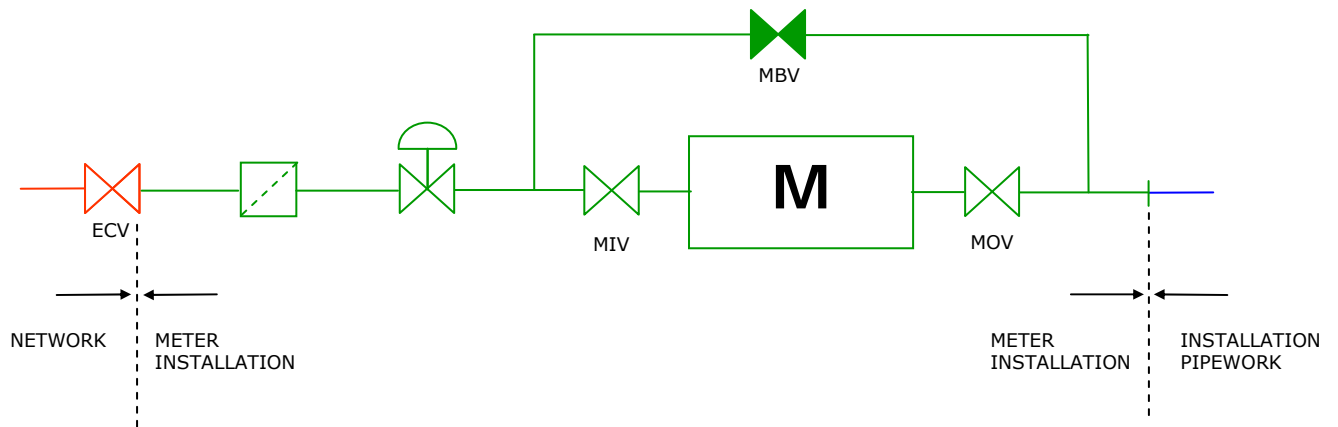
RECOMMENDED ARRANGEMENT.
